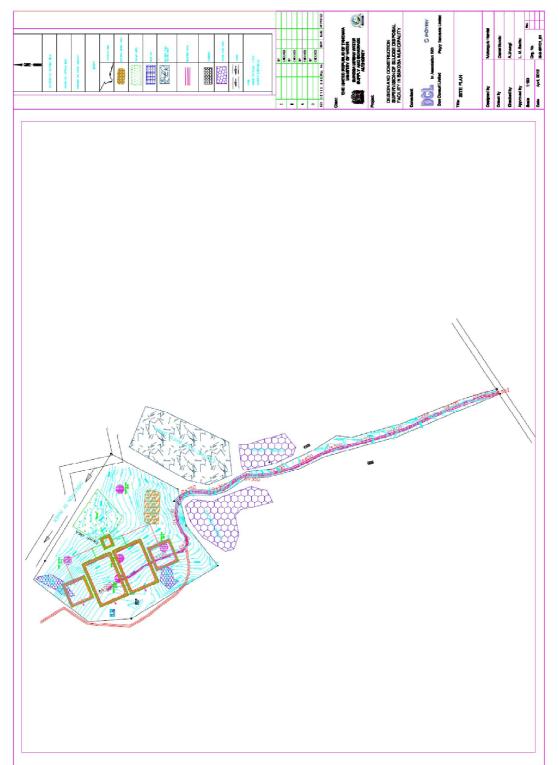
Site plan of the facility showing the access road, other nearby facilities and the position of the lagoons and the maturation pond
